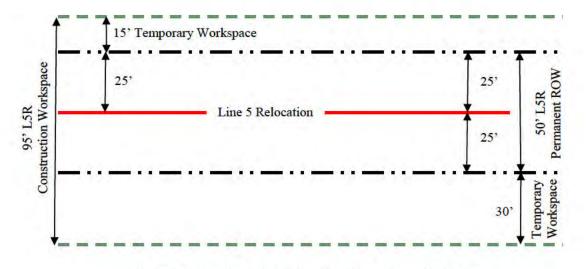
Typical Construction Workspace—Wetlands
